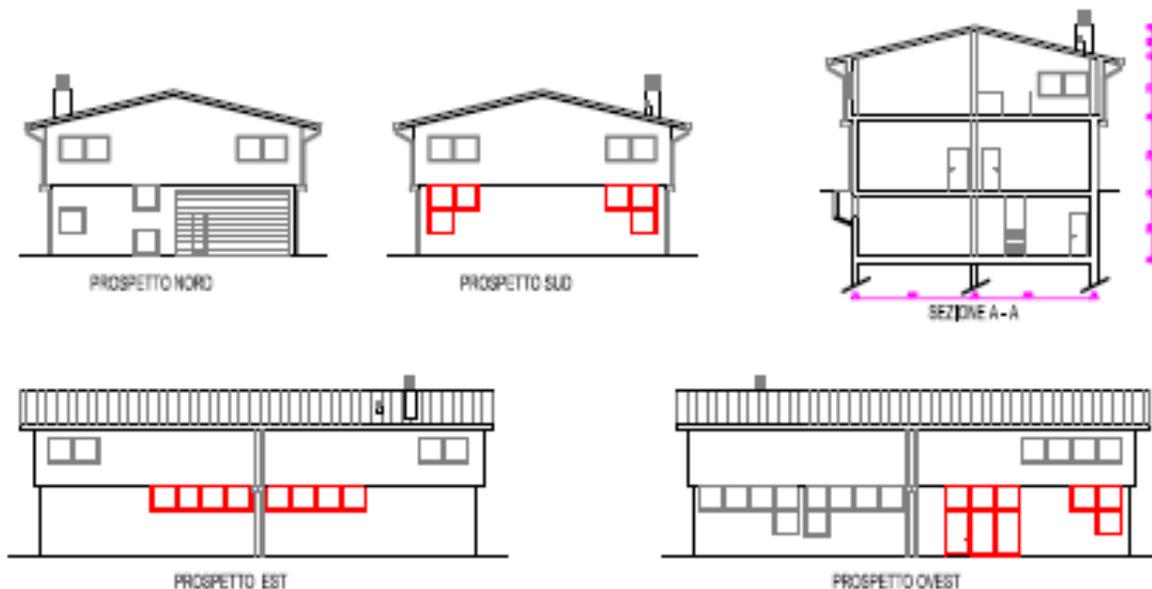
Perspective drawings of the building from North, South, section, East and West
